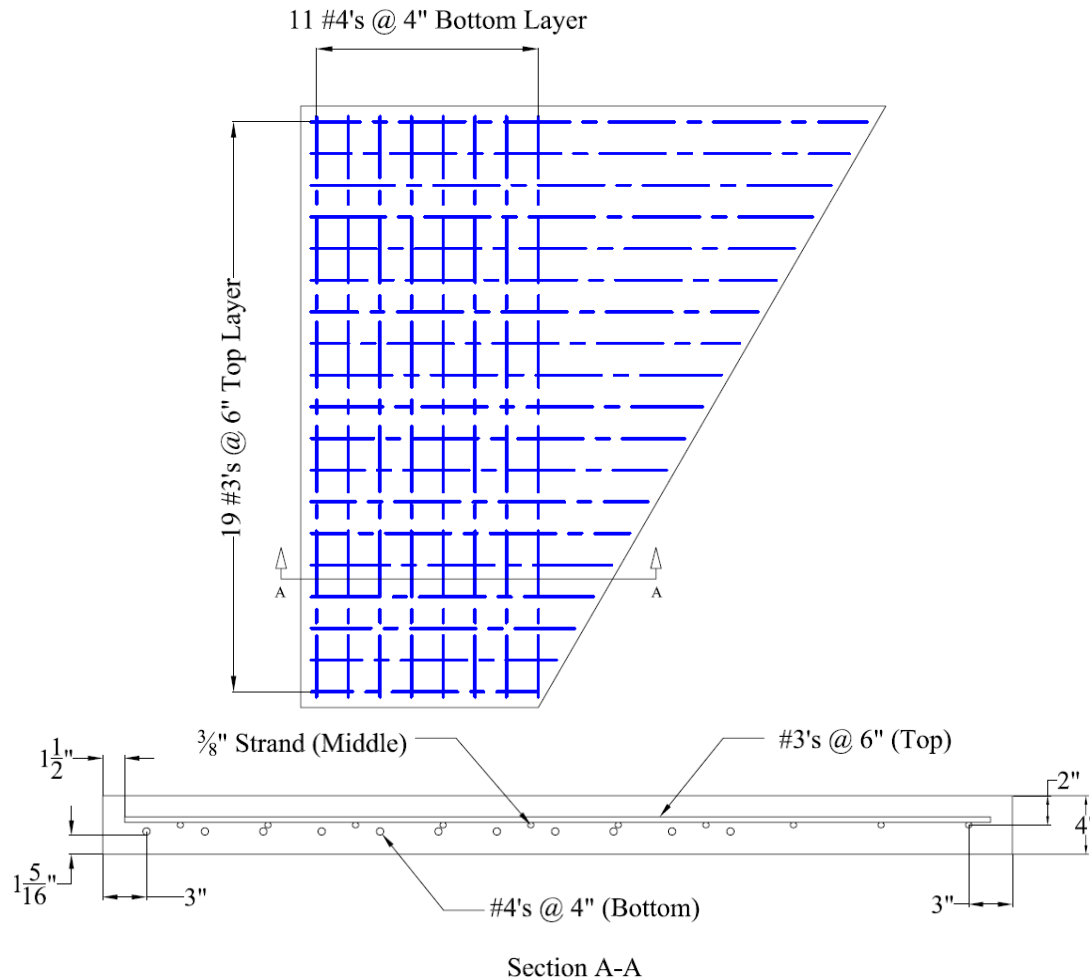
30° skew panel ordinary reinforcing layout and detail
